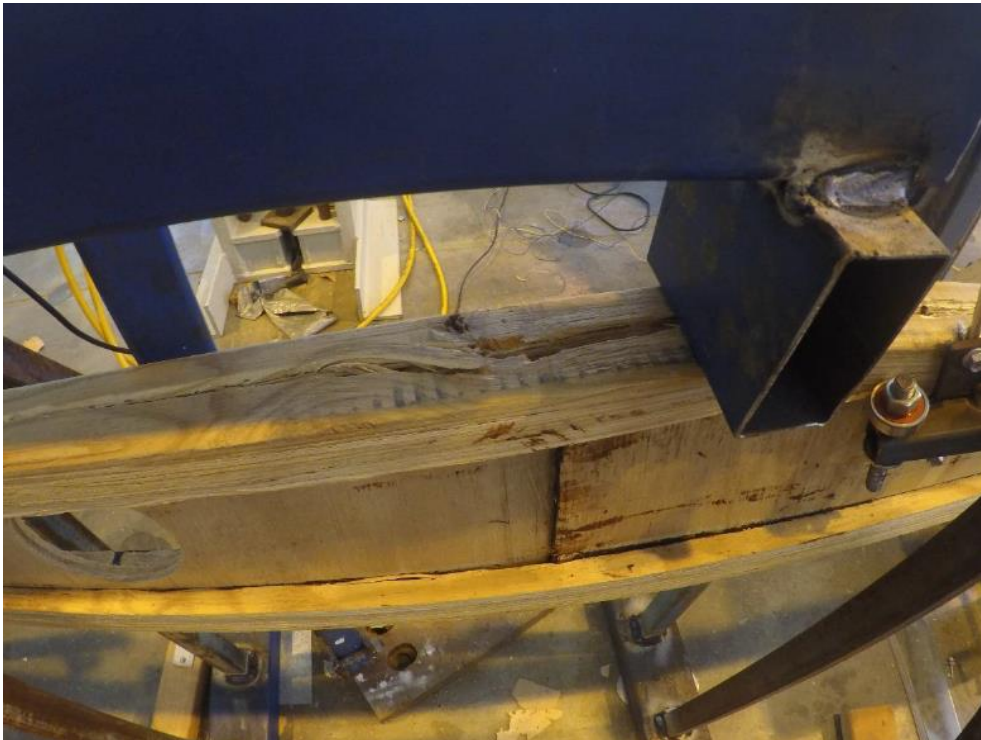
FAILURE OF UNTREATED TIMBER T SECTIONS WET-DRY SAMPLES: TOP FLANGE SPLIT LONGITUDINALLY AND BUCKLED
